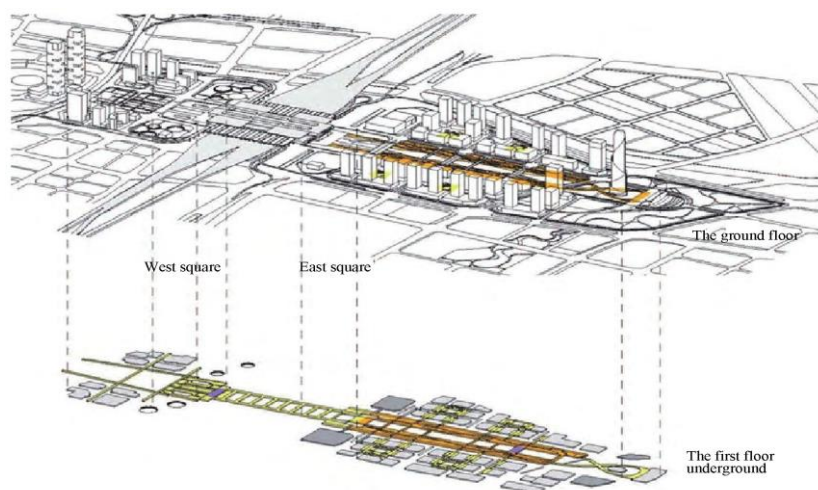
Layout of Zhengzhou East Railway Station Square and the underground space in the core area
